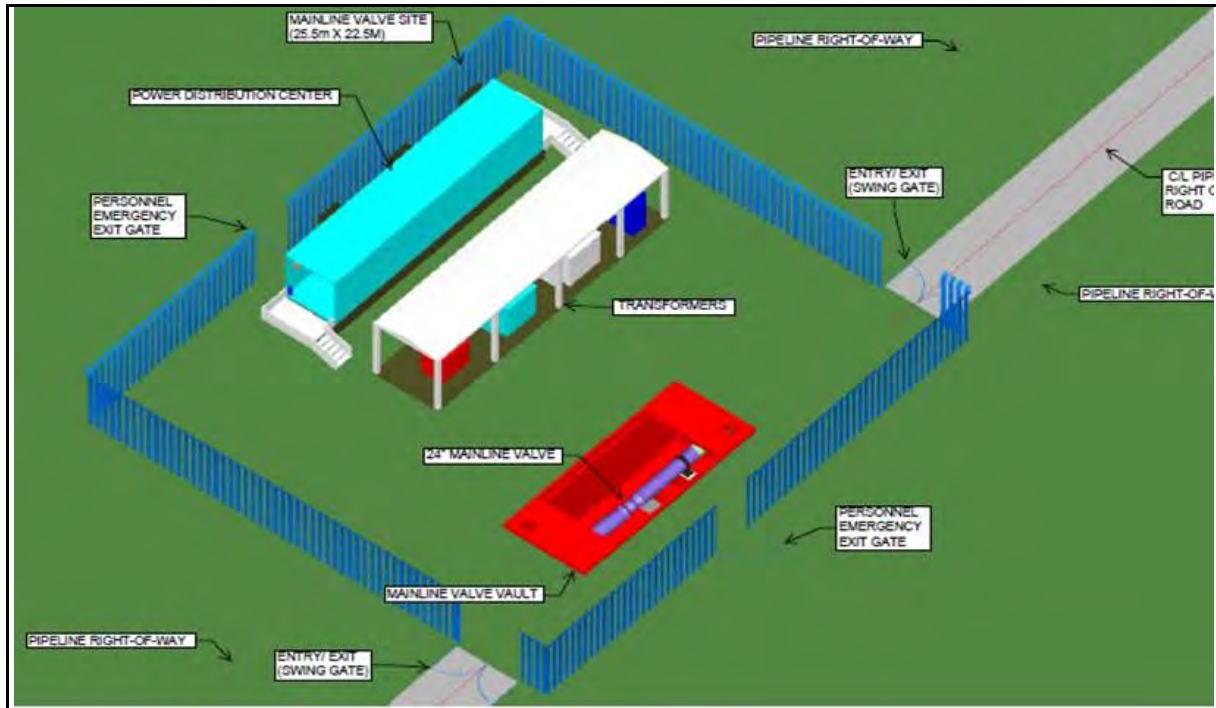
Typical Electric Substation with Main Line Block Valve Station
